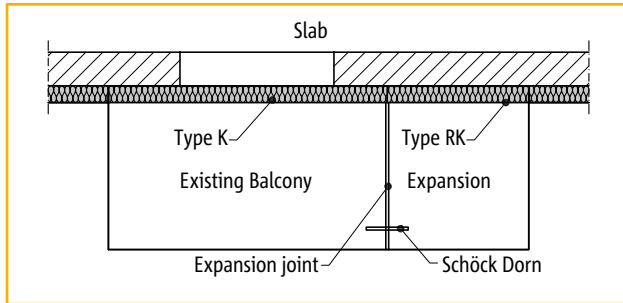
Balcony freely cantilevered with direct support with extension of an existing balcony - plan view
